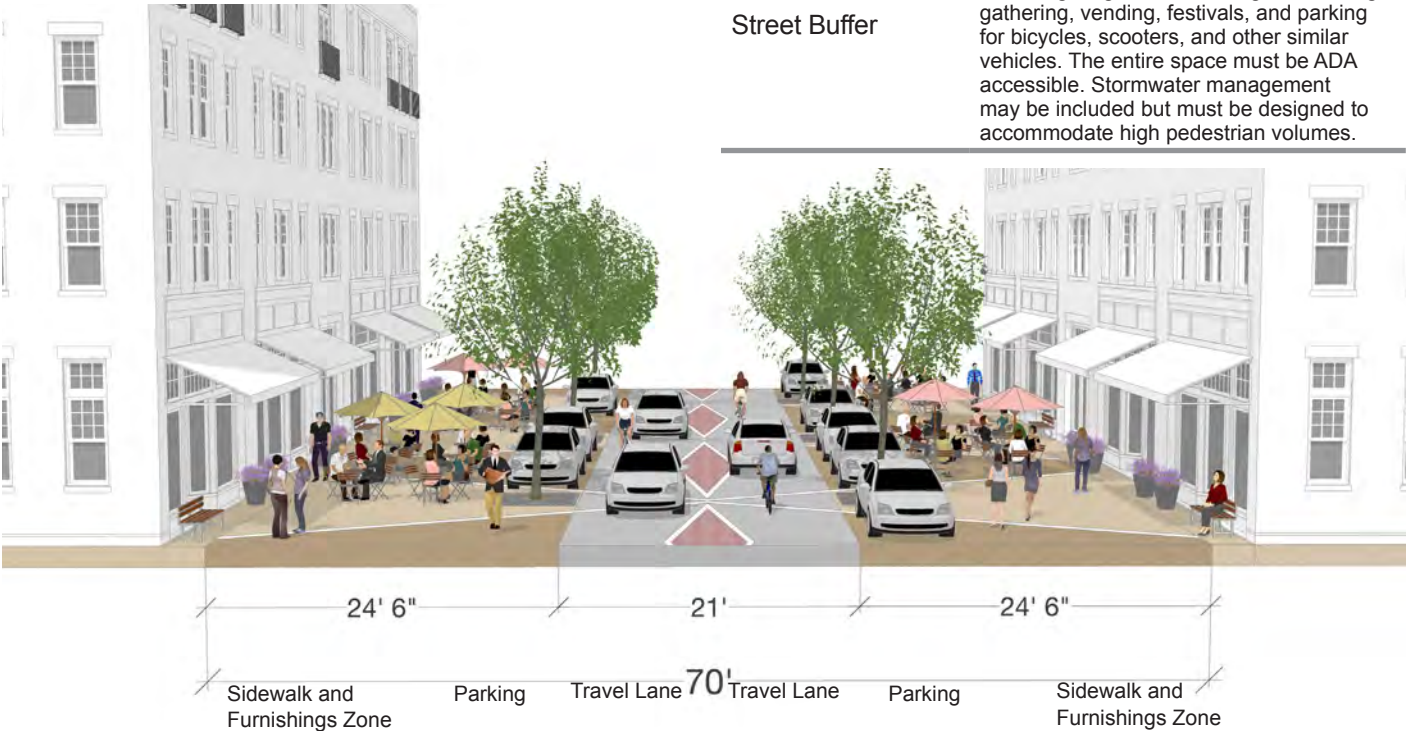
(3). Lake Promenade Market Street Section (illustrative)
